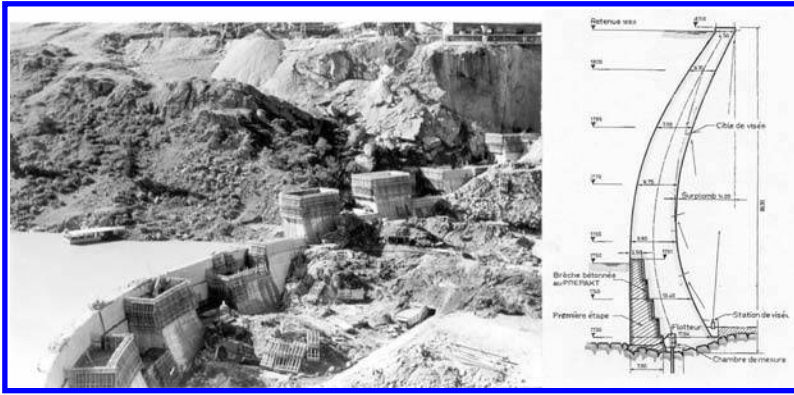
Construction of Les Toules arch dam in two stages—picture (left) and cross-section (right).
